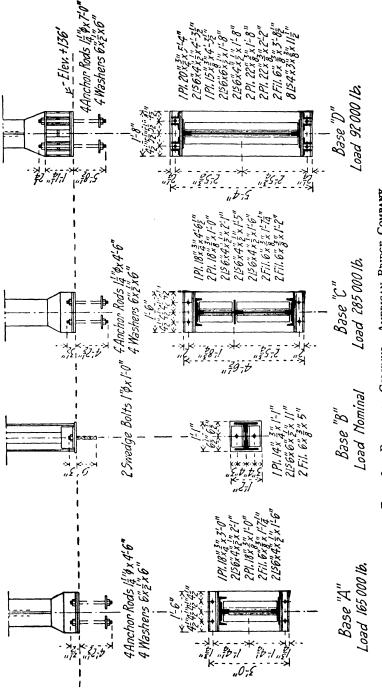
BASES FOR COLUMNS. AMERICAN BRIDGE COMPANY.
